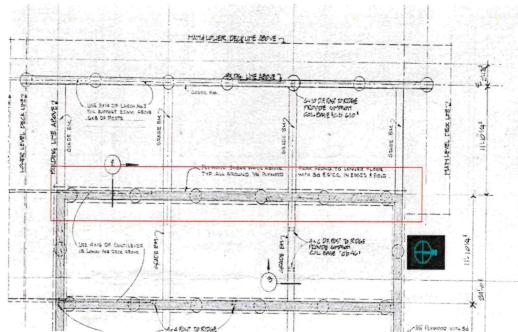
1972 Approved Structural Construction Plans (Partial)
